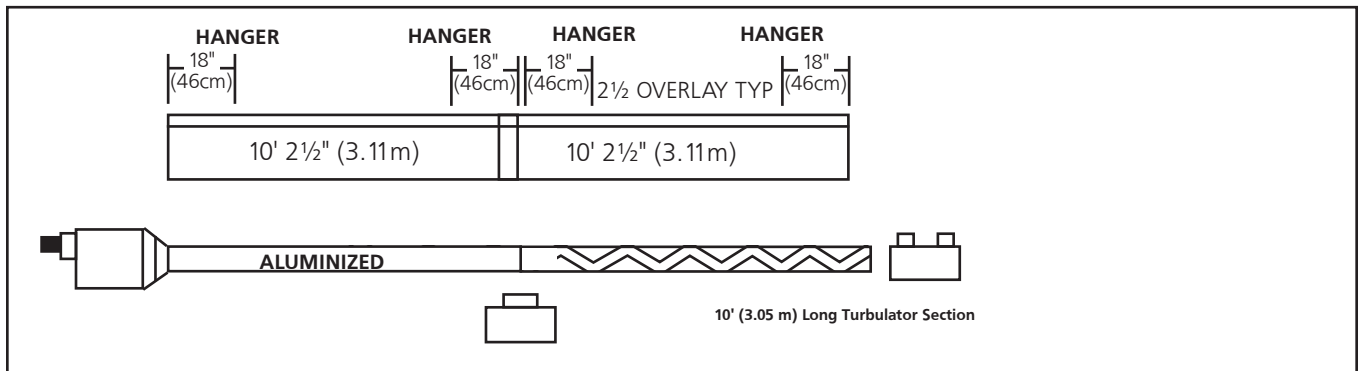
C: Ener-Radiant SP Model ERSP-80, Assembly Overview
